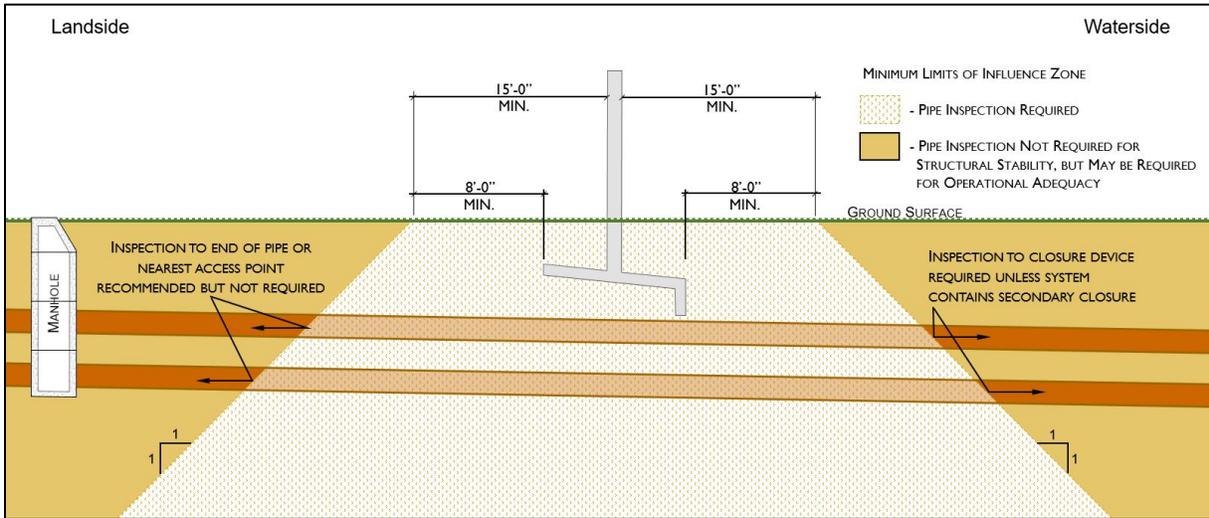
Gravity pipes beneath a floodwall (T-wall).
